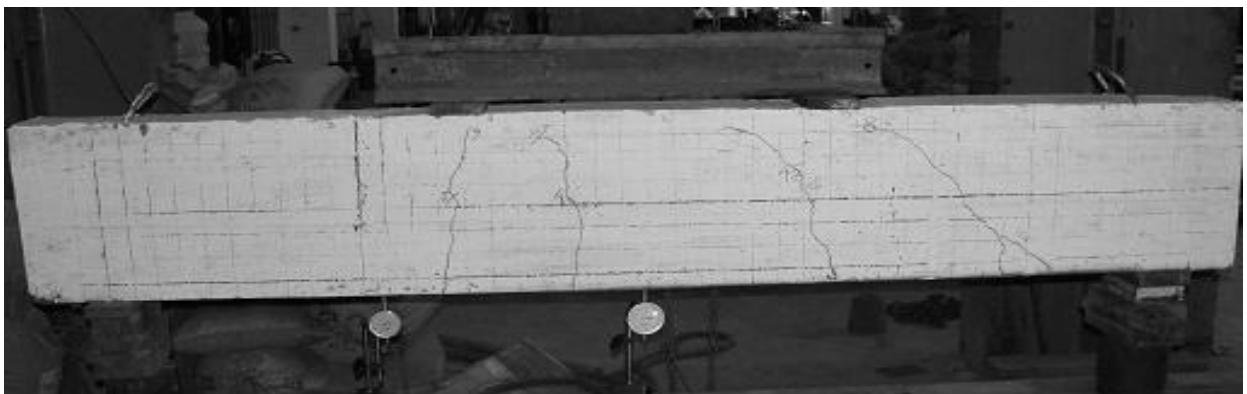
Failure pattern for 1.5% bamboo reinforced beam
